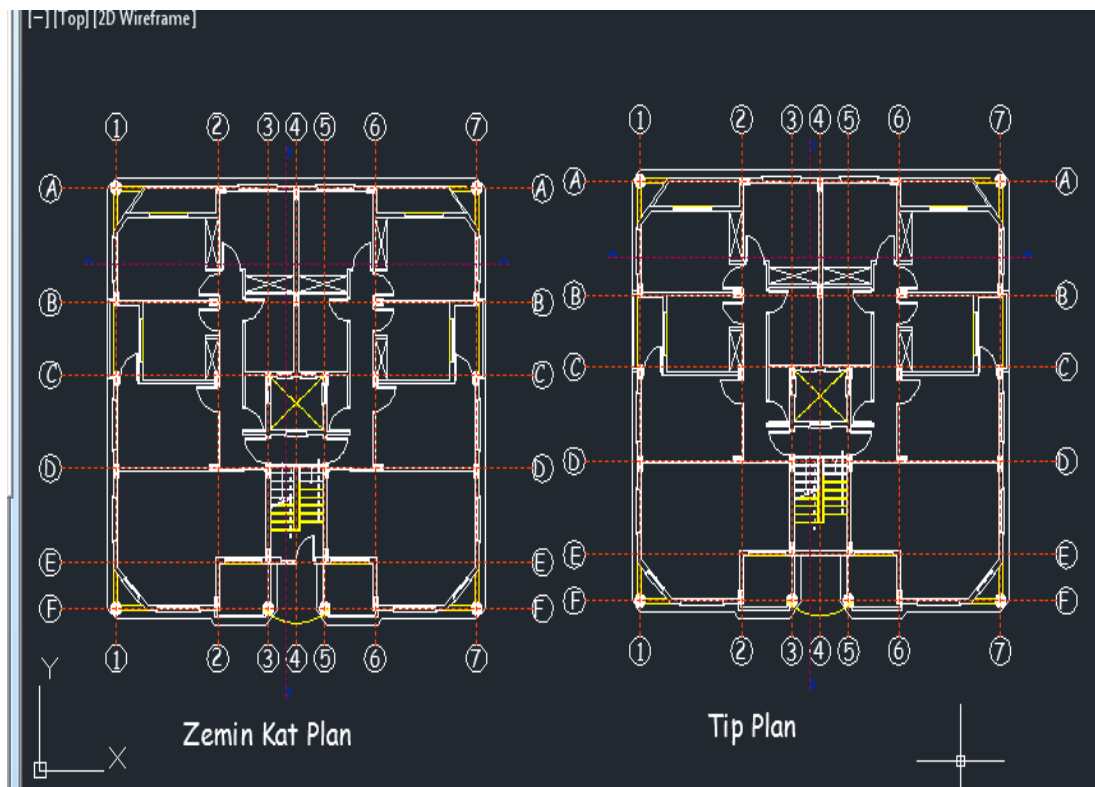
Ground floor plan and first /second floor plans of the apartment building in AutoCAD (2D drafting)
